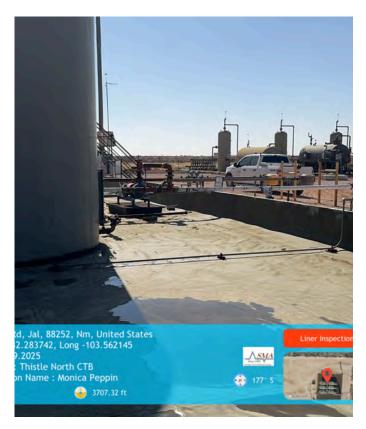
Viewing liner around transfer pump on north wall facing east.
